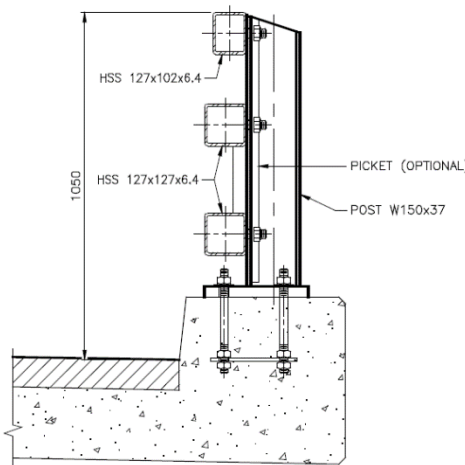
Existing Connection of Traffic Railing to Lift Span Deck
